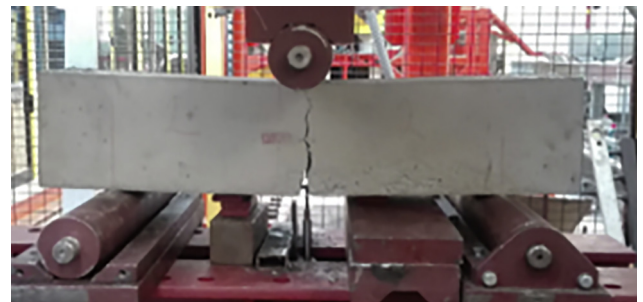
Realization of the 3-point bending test of fiber concrete after failure
